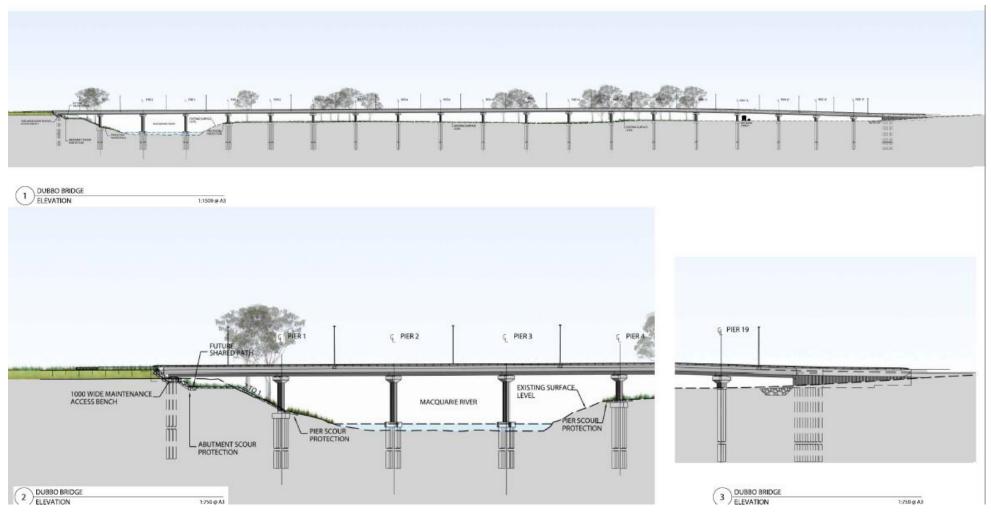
Proposed modified pier arrangements across the New Dubbo bridge
